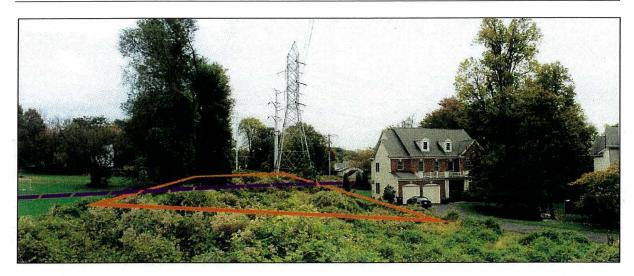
Photograph illustrating the route of Underground Alternative 03 showing the temporary HDD workspace east of I-66 and north of Idylwood substation with no tree removal within 053-0276 (Photo view 9).
